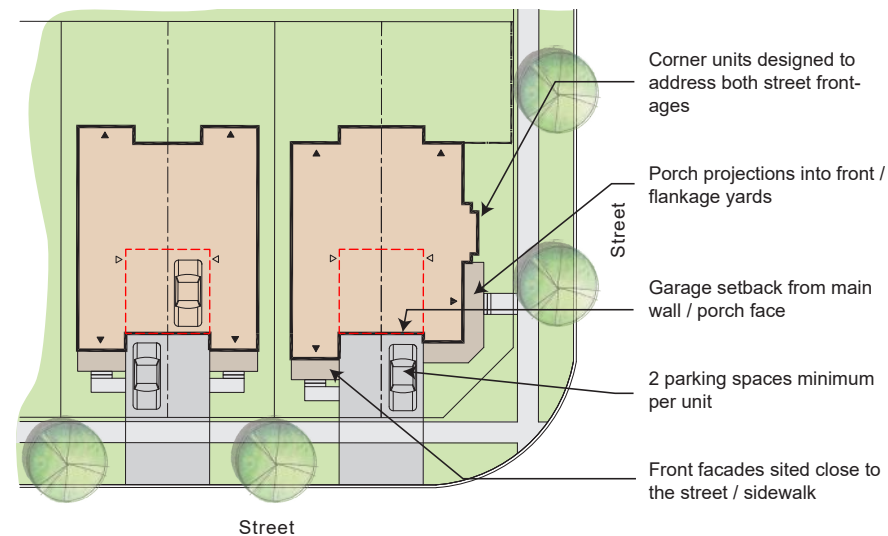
Conceptual plan layout for semi-detached dwellings
